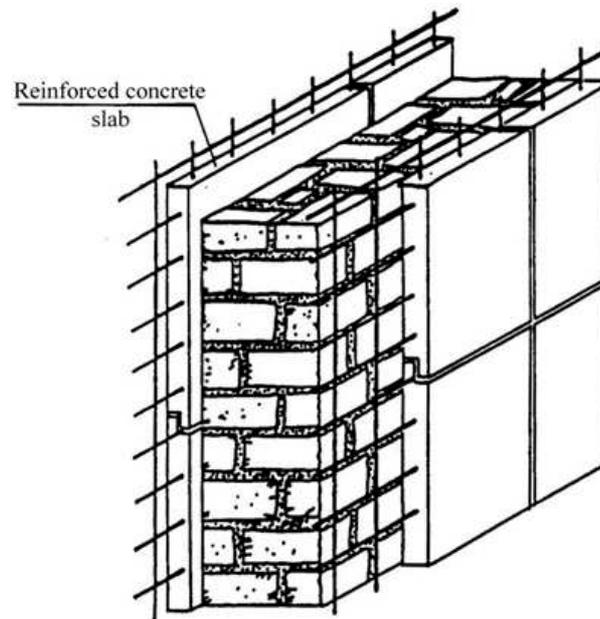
reinforced concrete jacketing of a wall. (EU-India cross program, 2006)
